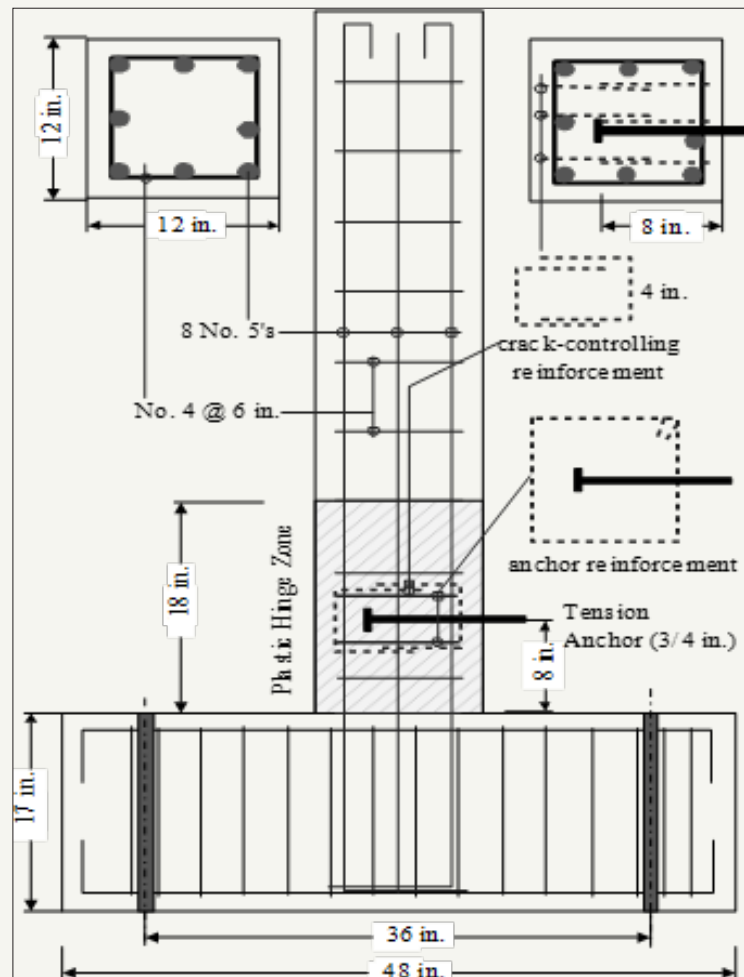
Dimension and reinforcement of tension specimens (1 in.=25.4mm).
